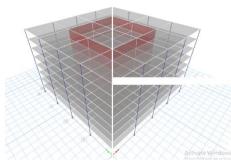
G+6 Building with RCC Full Shear wall on inner peripheral Walls
